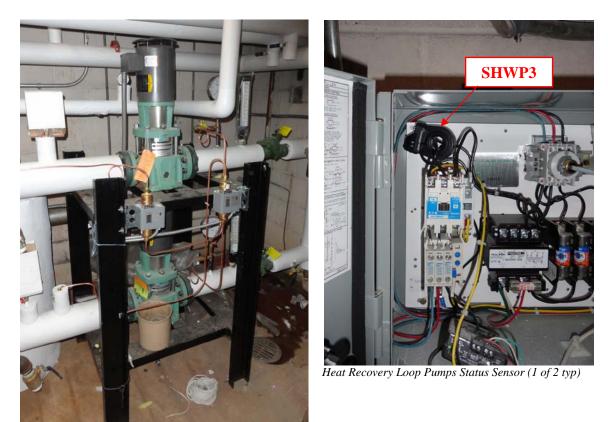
Heat Recovery Sensors (FL to be installed in valve assembly)
